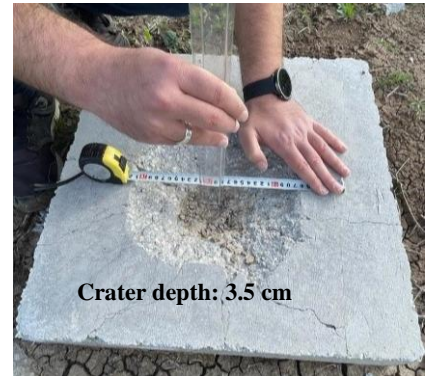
The crater depth of 10% CFGC exploded with 150 g TNG.
